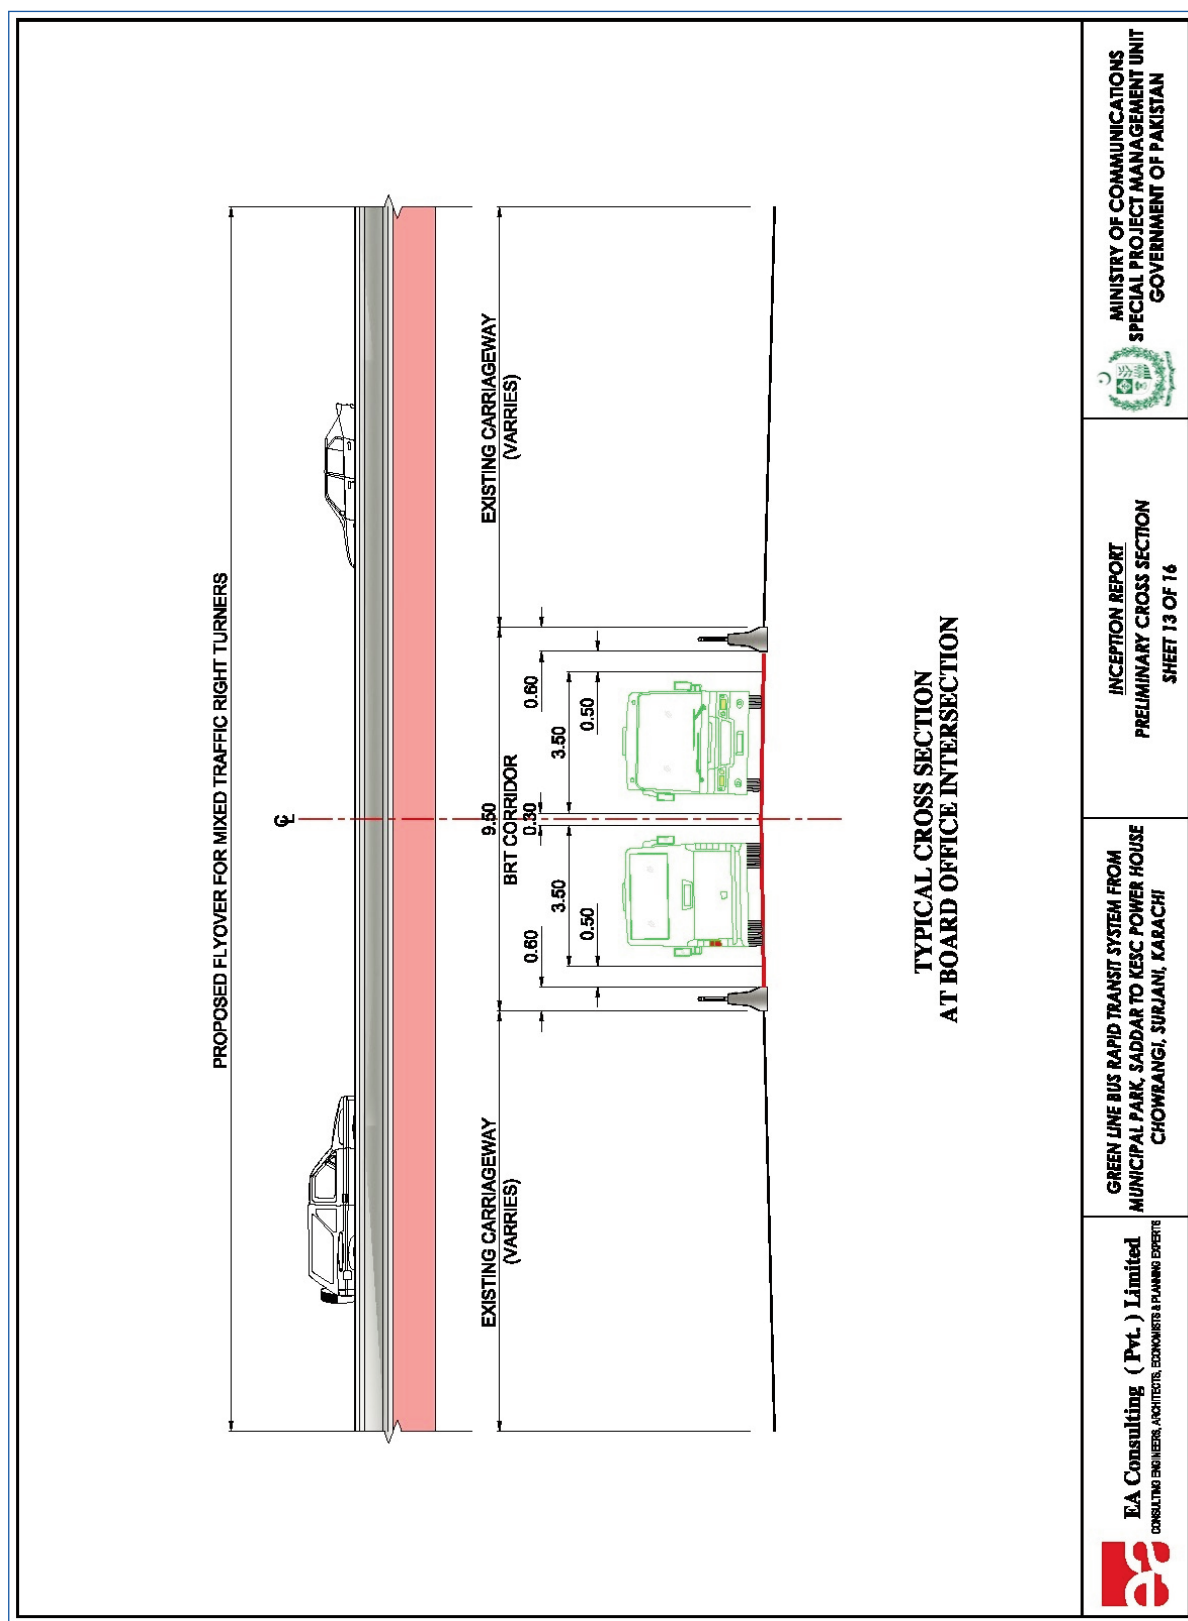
Segment 3: X-section of Bridge at Board Office Intersection
